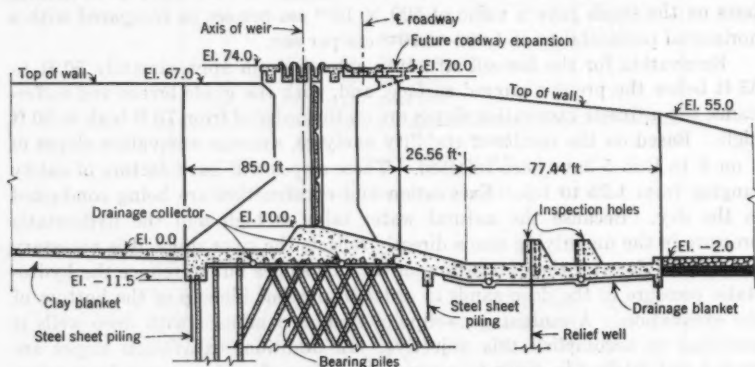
TYPICAL SECTION OF THE LOW-SILL STRUCTURE
